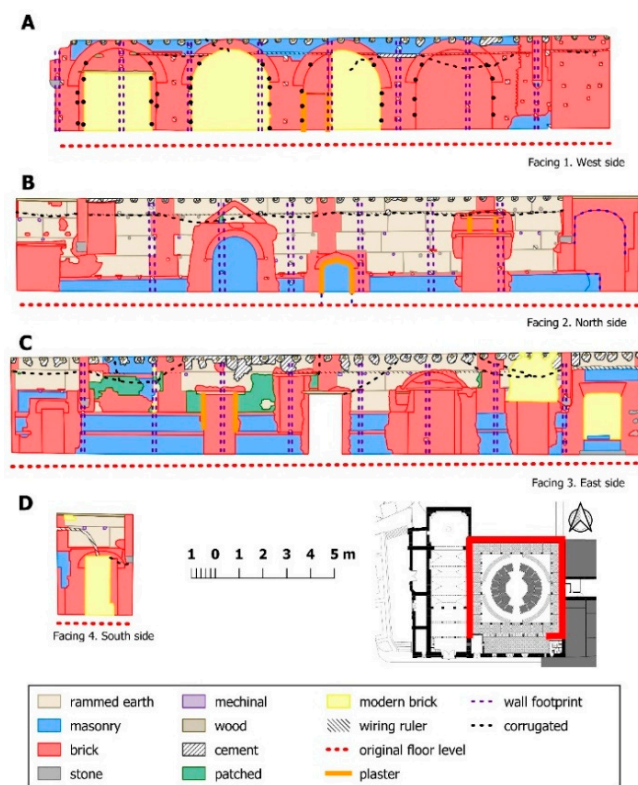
Construction materials and elements: (A) west wall, (B) north wall, (C) east wall, (D) south wall.
